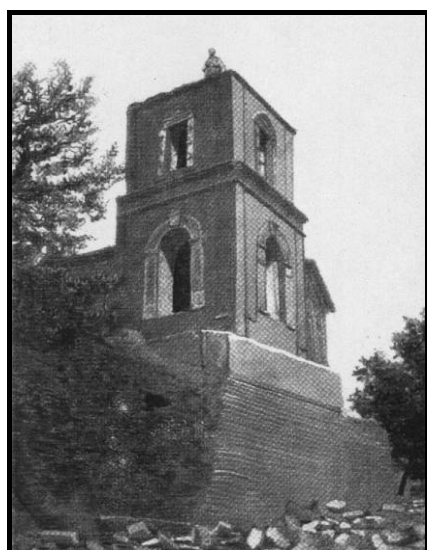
Damaged clock tower at Gelibolu (Sadi, 1912).
